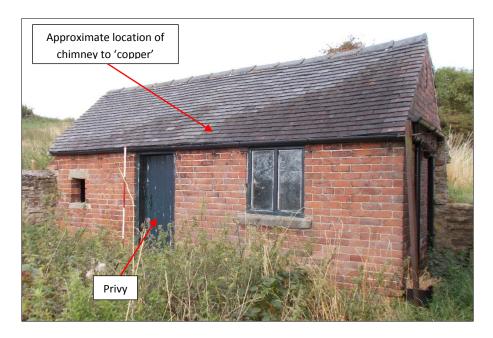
The wash-house south elevation, looking north-west; 2m scale.
